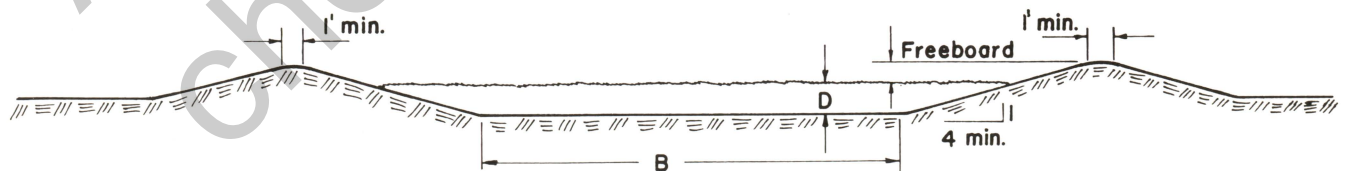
Cross section of a trapezoidal-shaped waterway, showing permanent side dikes.
